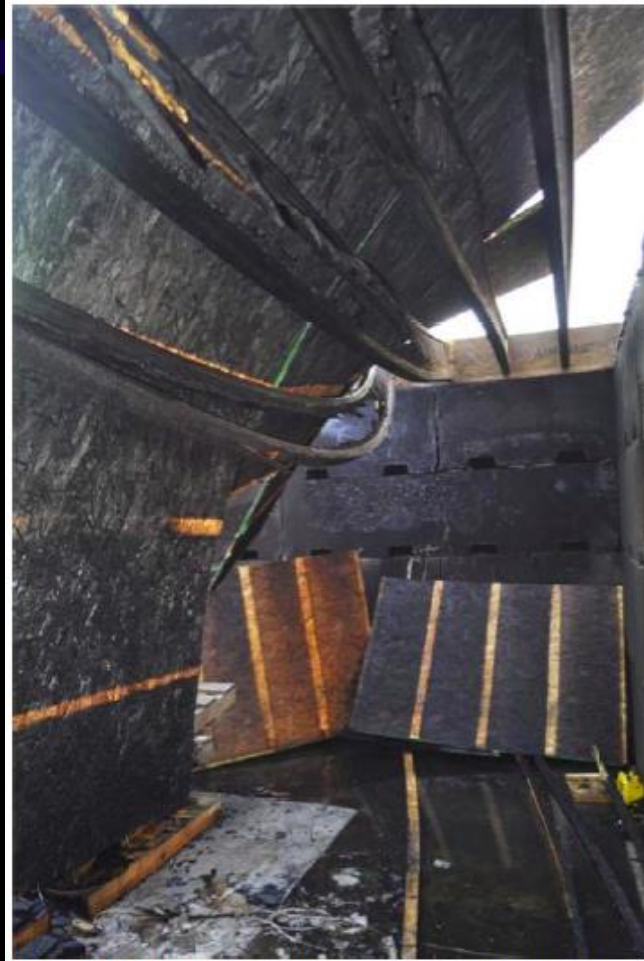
Web burn-out of engineered I-joists at rear section of floor area.
